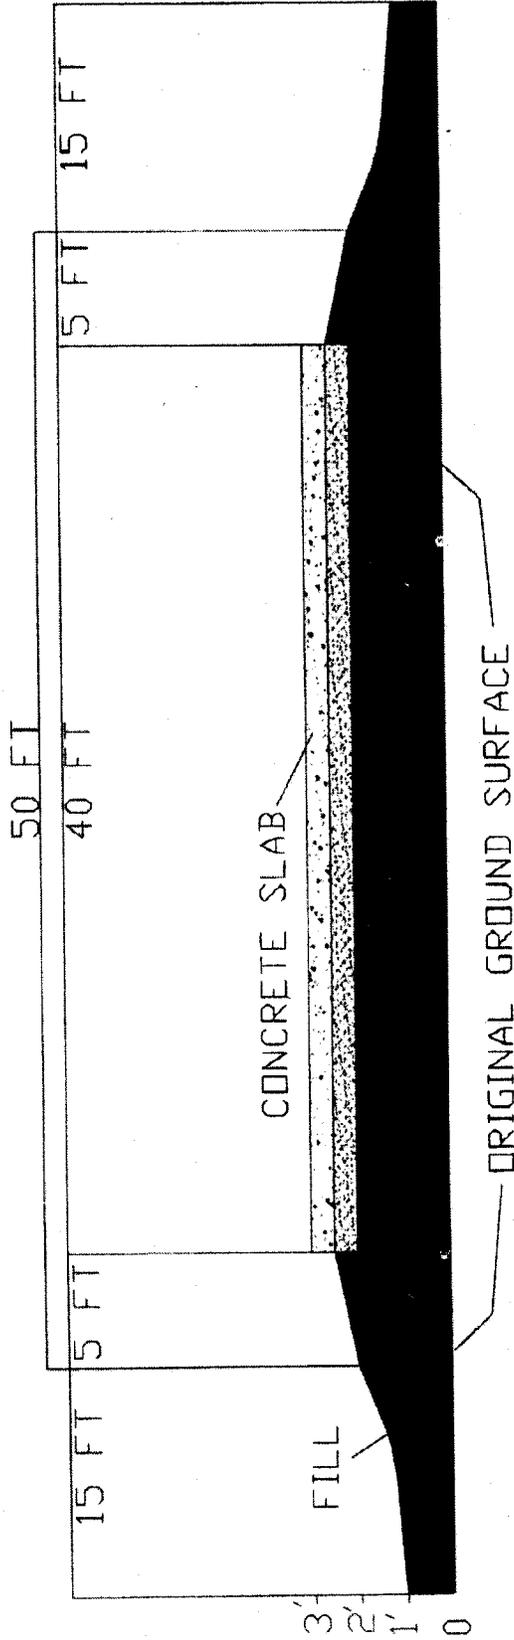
TYPICAL SECTION VIEW OF ROAD CROSSING IN WETLAND.
